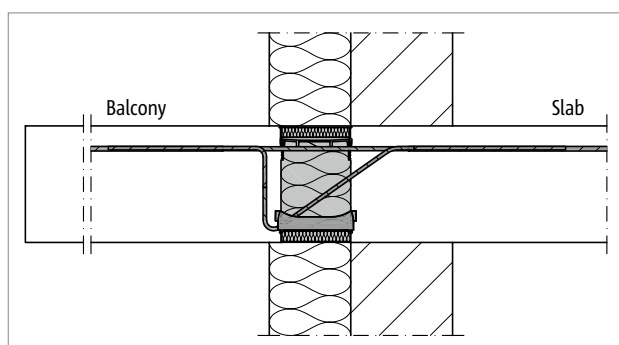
Schöck Isokorb® XT type K: Connection with thermal insulation composite system (WDVS)
